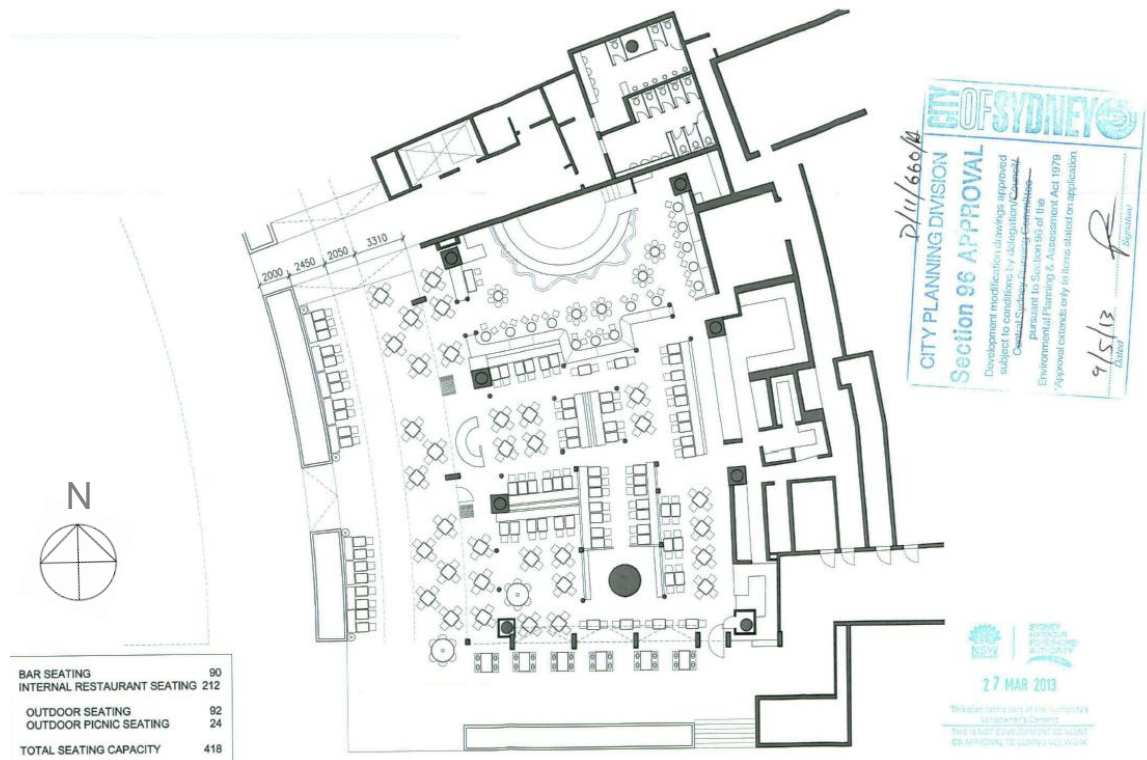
Stamped approved plan D/2011/660/A (AD Design Pty Ltd)
